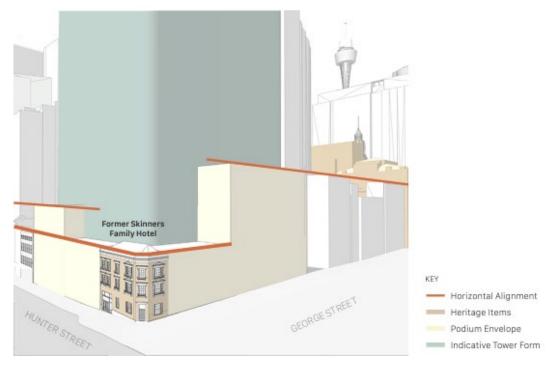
Hunter Street and George Street – Proposed Responsive Street wall Height
